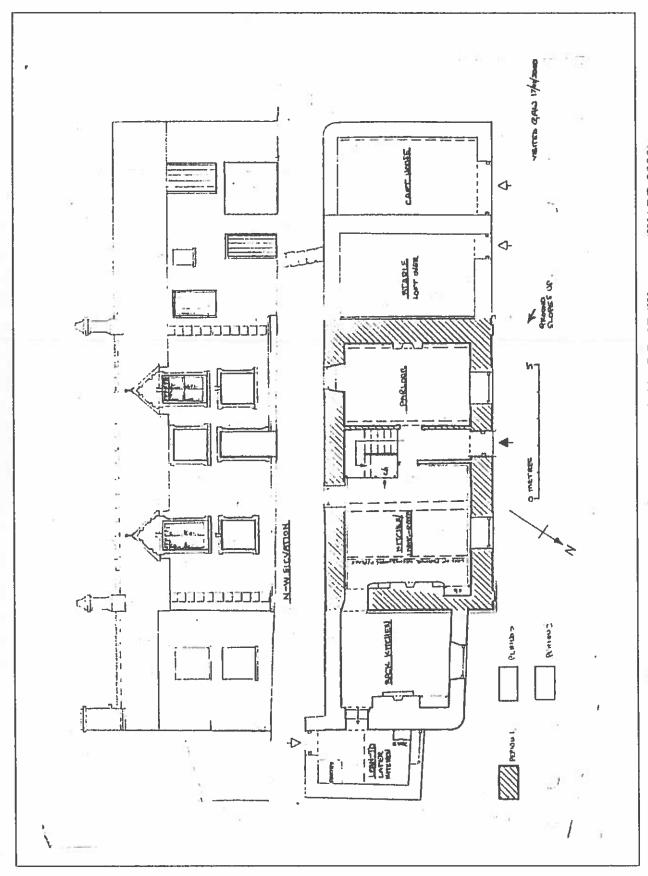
Elevation and ground plan of Gelli-Gron as recorded by RCAHMW survey (WARD 2000)
